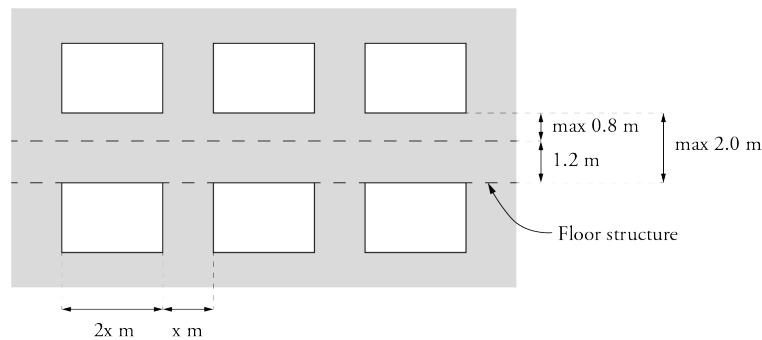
Design restrictions for the concrete models. Height of the beams is maximum 2.0 meters and horizontally, the ratio structure/opening should be at least 1/2.
